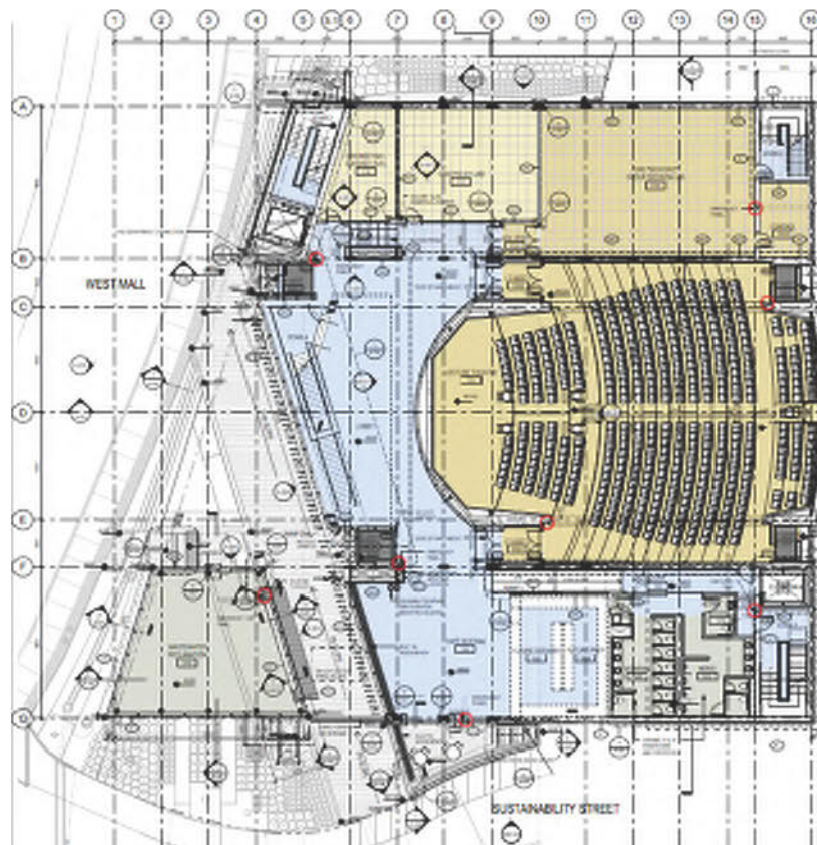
Partial Ground Floor Plan, CIRS, UBC (Perkins+Will, 2009).
